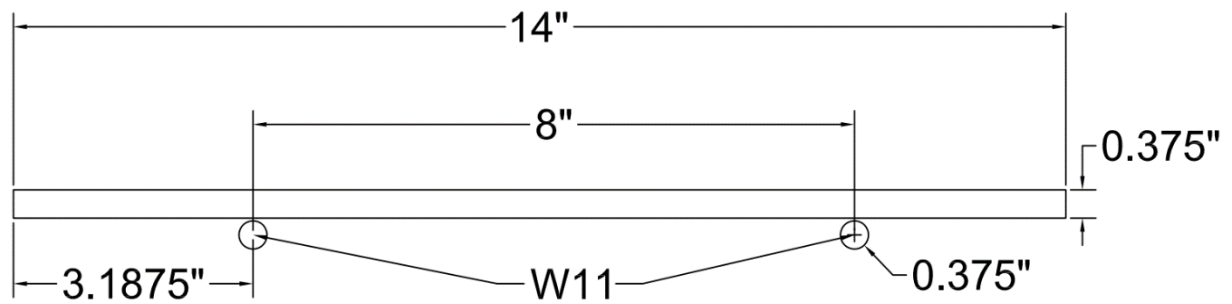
CAD drawing showing dimensions of reinforcements for Test 7.
